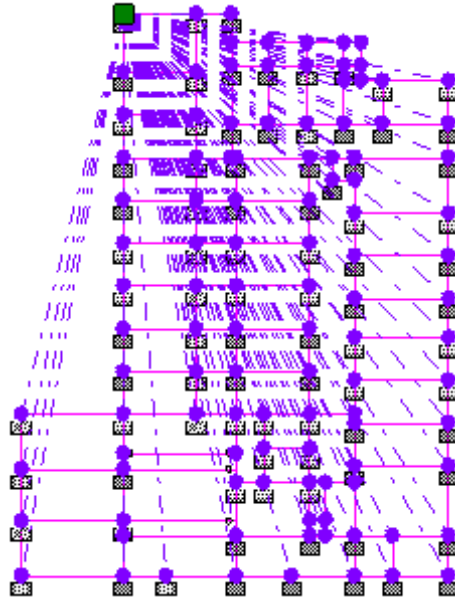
STAAD Model of Hospital Building (with diaphragm) in plan view
